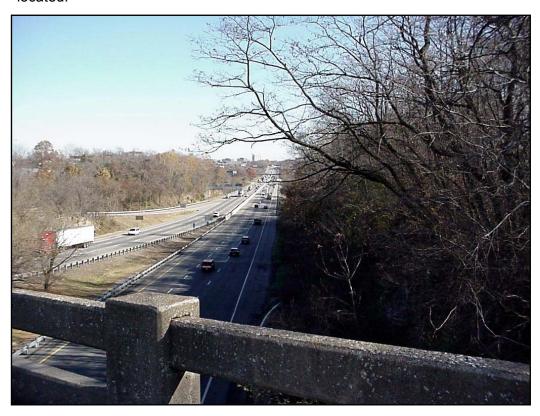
Proposed ramp location (Spence Lane to I-40 Eastbound)
